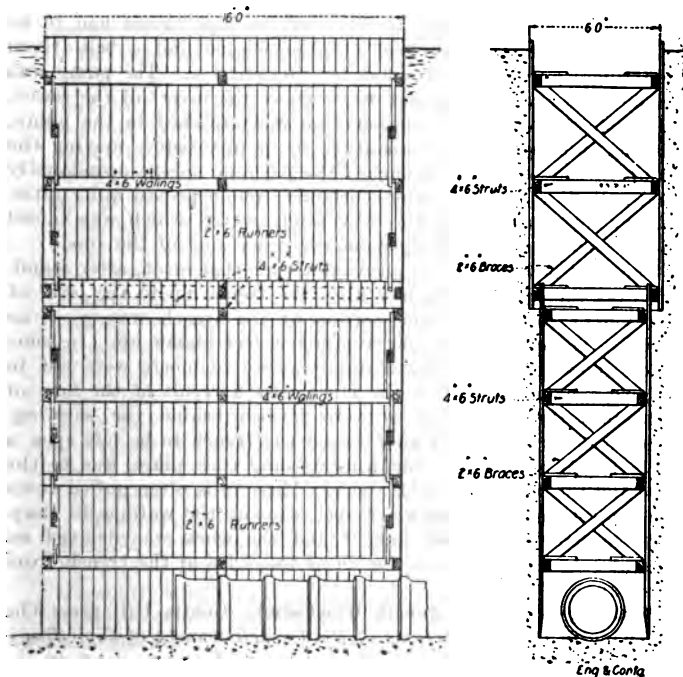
Longitudinal and Transverse Sections of a Top and Bottom Setting of Timber for 30-Ft. Sewer Trench in Quick-sand.
